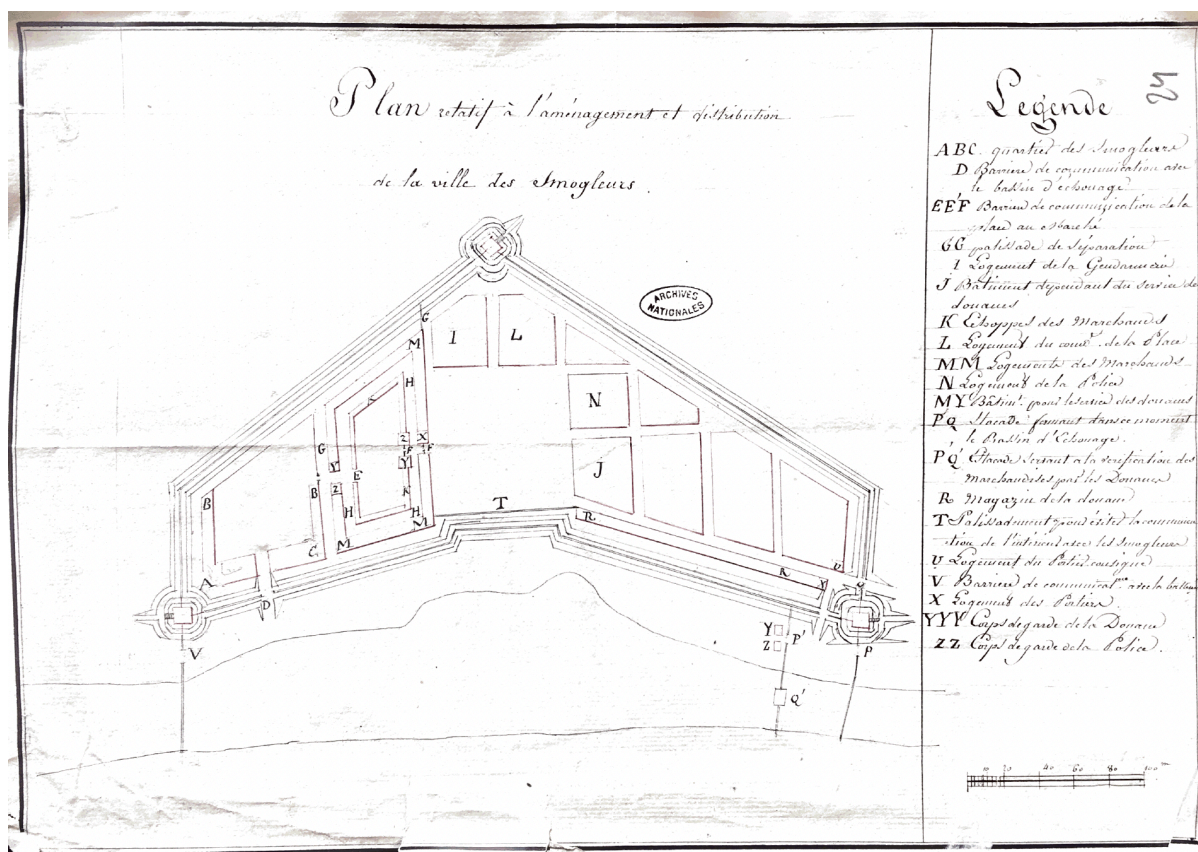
Plan of the Smugglers' Town of Gravelines, 1811, AN F/7/8360
